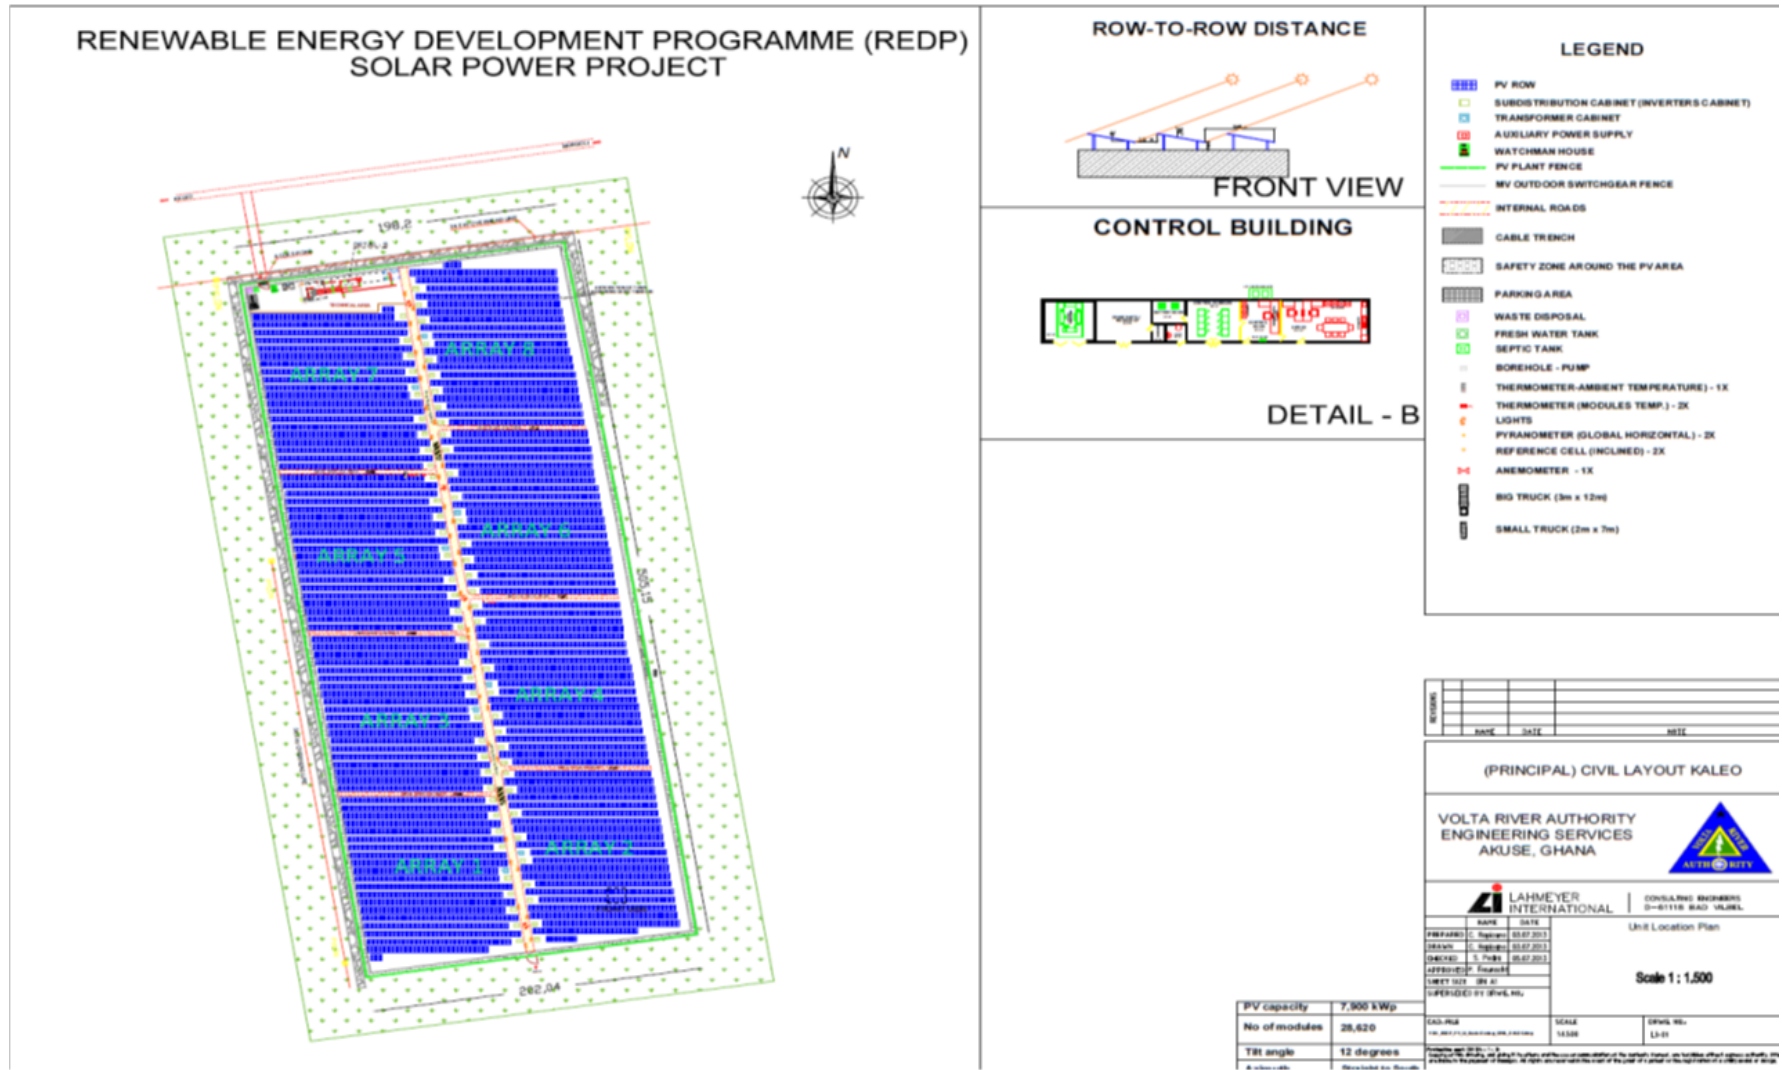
Design Drawing Showing Civil Layout for Kaleo Site
